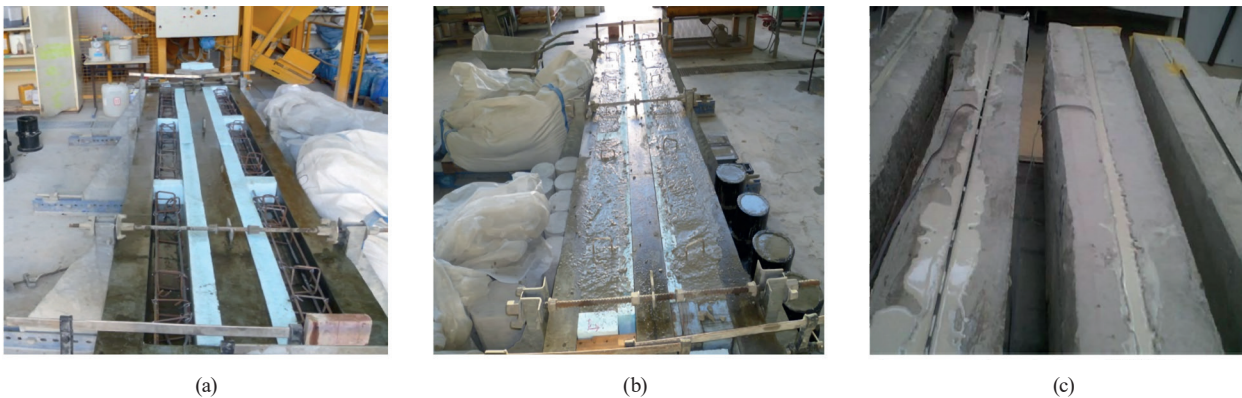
Strengthening procedure (a) Steel reinforcements assembling, (b) Concrete mixture pouring, (c) Groove cutting, placing of CFRP bars and epoxy filling
